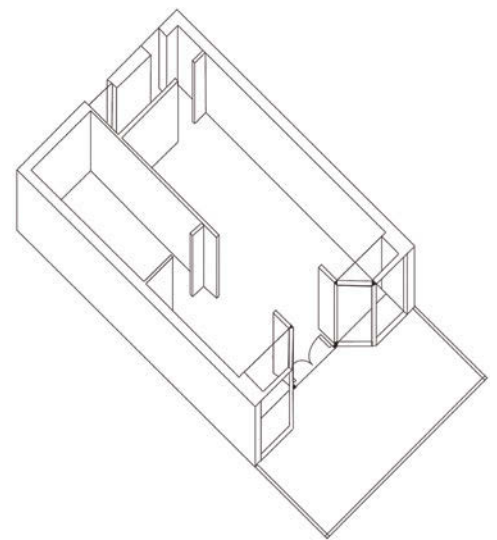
Planometric drawing of a shop by Alex Hopper. A planometric drawing allows the interior detail of a building structure to be visible. This type of drawing method could be used as a presentation drawing or as a means of refinement.
